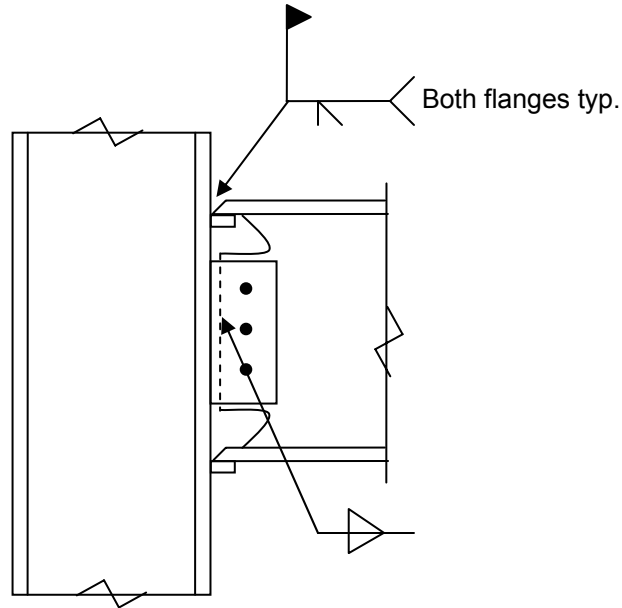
Directly Welded Flange FR Moment Connection
